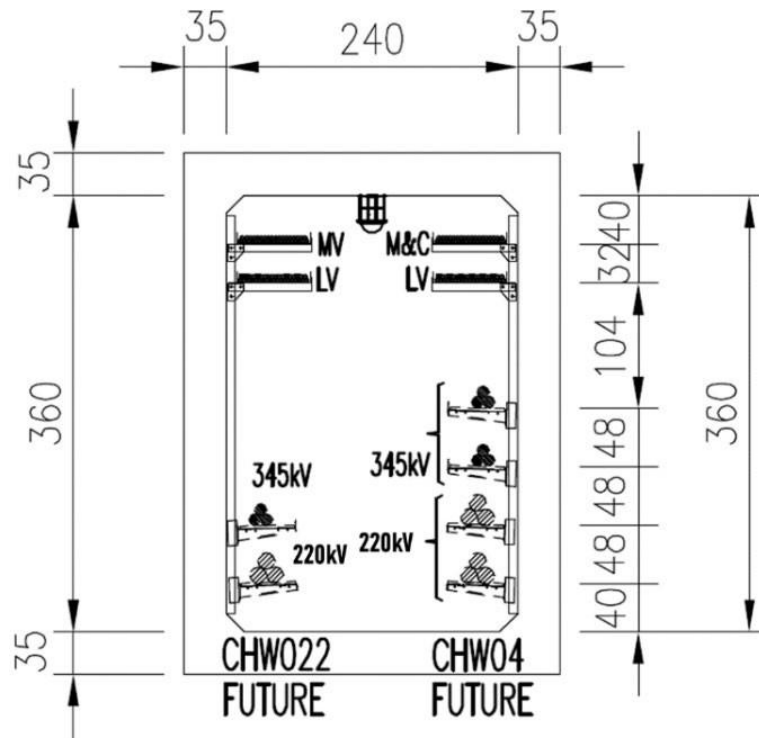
Onshore Cable and Culvert Profile
